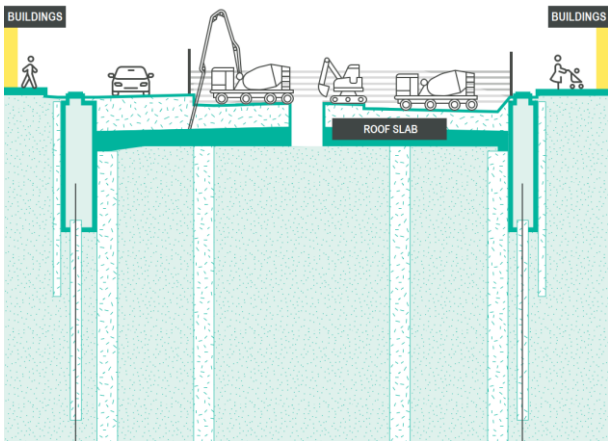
Phase 2: roof slab (photo credit: STIB-MIVB)
